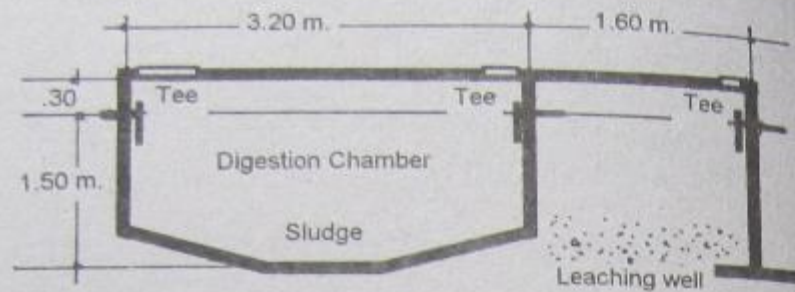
CROSS SECTION OF SEPTIC TANK
